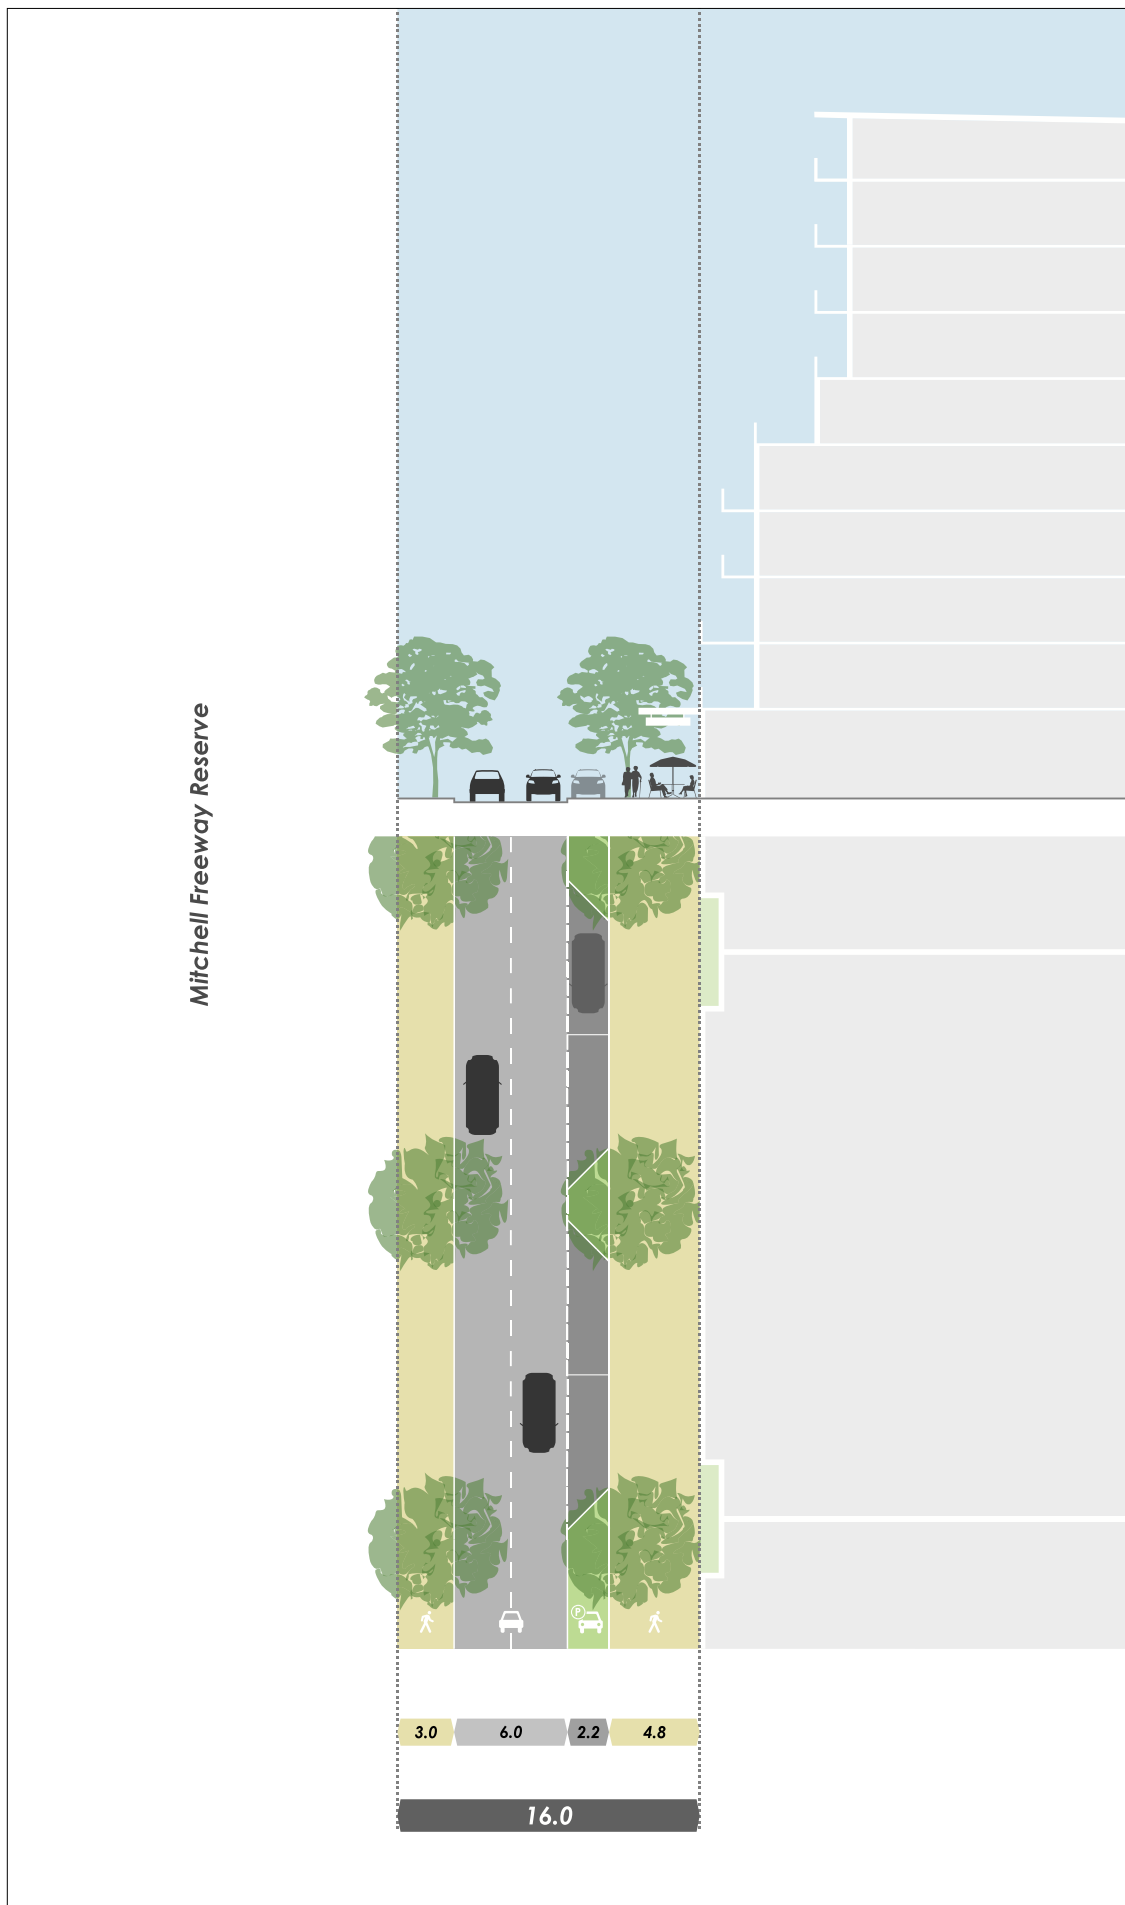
D - New Roads Cross Section - Abutting Freeway - 16m
